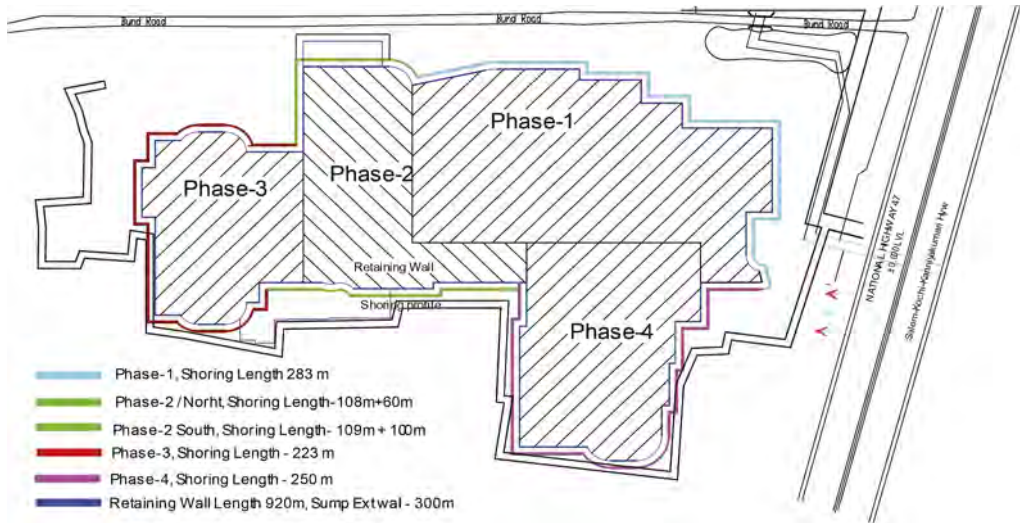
Plan indicating phases of construction and retaining requirement for excavation.
